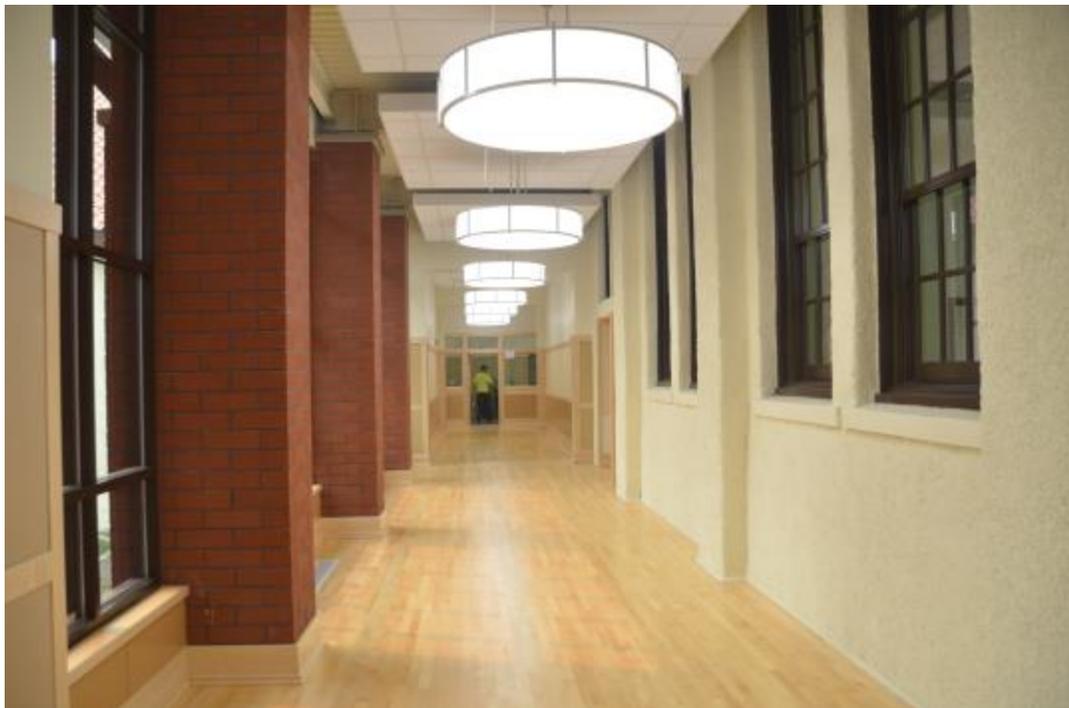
Looking West Along Hall To 1930-31 Addition, Former Gym to North
